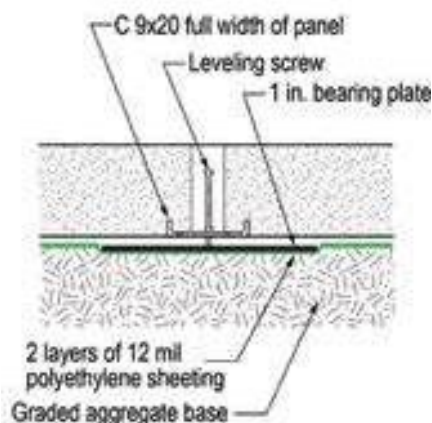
Levelling screw schematic (Note 1 in. = 25 mm; 12 mil = 0.31 mm)
